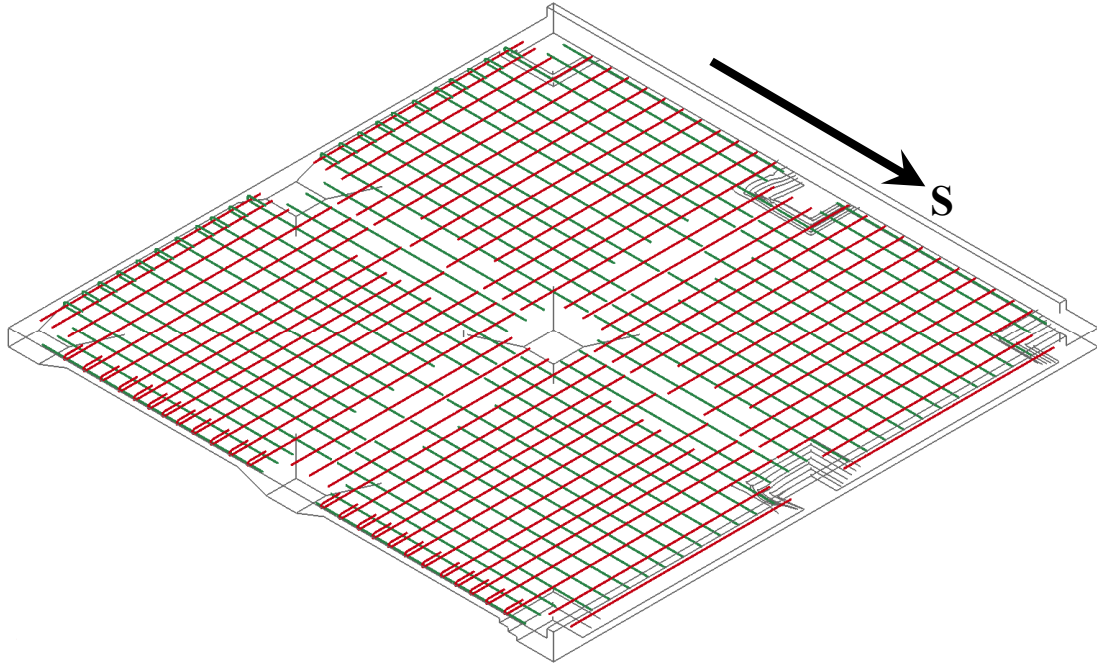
Isometric view of the slab bottom mat, red - EW #3 rebar, and green - NS #3 rebar. An outline of the concrete model is shown in grey.
